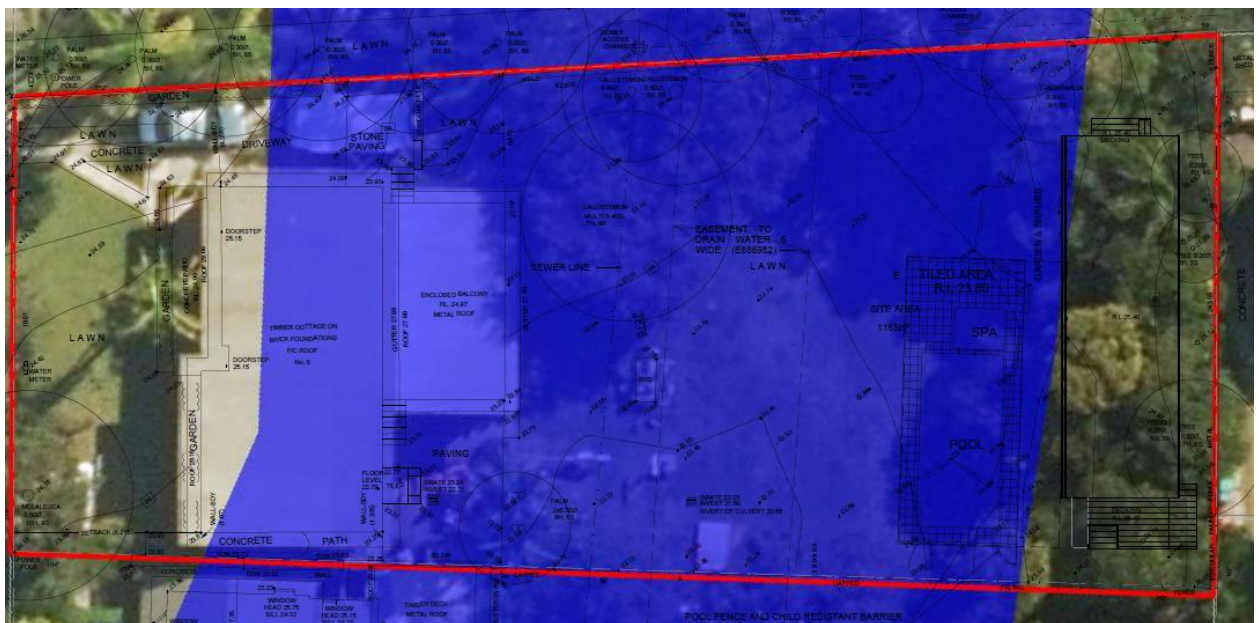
Ground floor plan overlay with Flood Risk Precinct Map
